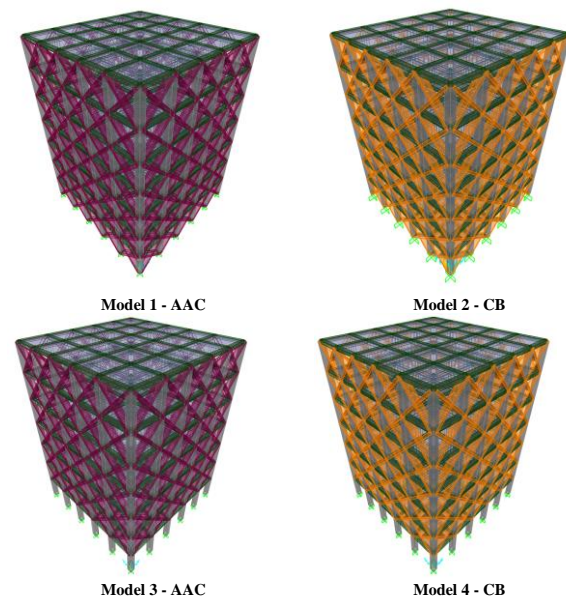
Models of aerated autoclaved concrete and conventional brick infill wall structures
